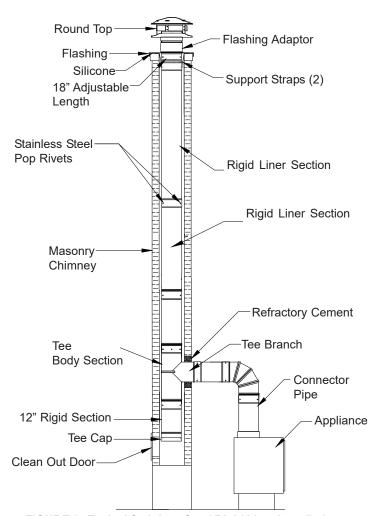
Typical Stainless Steel Rigid Liner Installation
